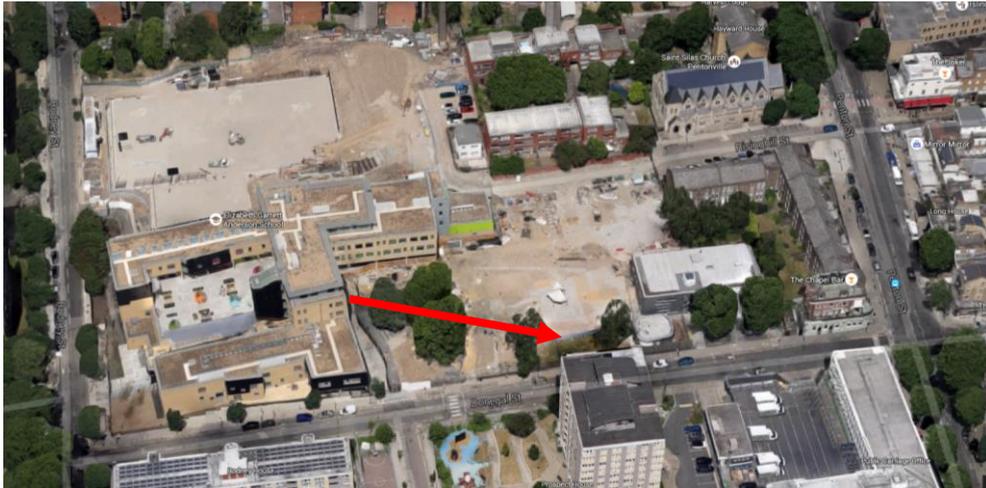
Aerial view of the site arrow pointing at location of classroom pod.
